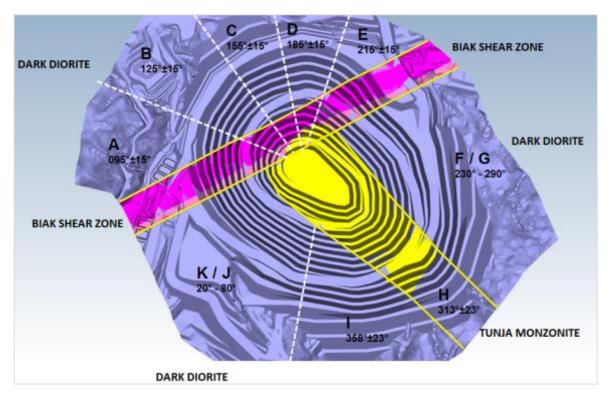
Plan view of Stage 6 pit design with design sectors
